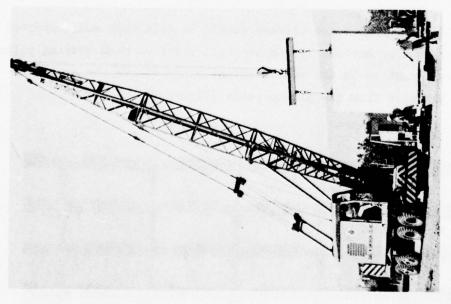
Truck crane (courtesy of American Concrete Institute59)
